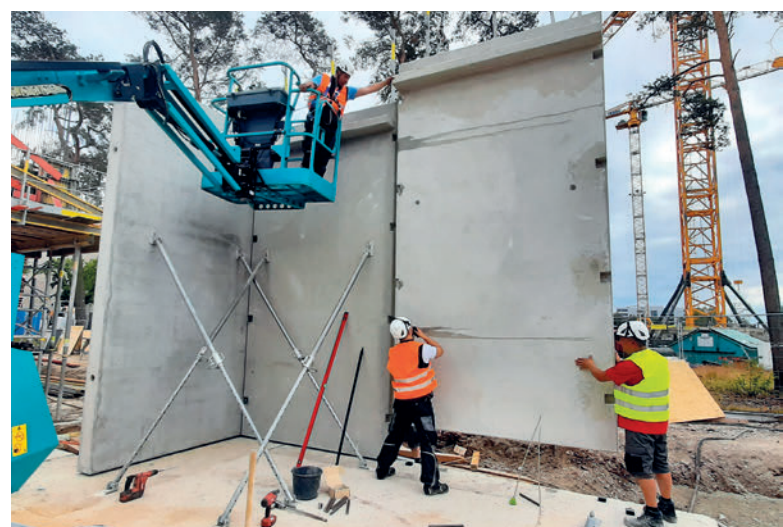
Wall installation at Siemens Campus Erlangen, connection of the walls with the BT-Spannschloss® turnbuckle
